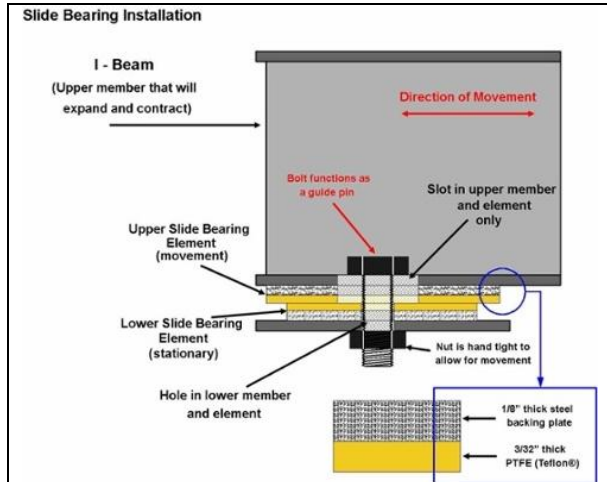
Schematic drawing of a typical slide bearing system. (Image courtesy of Steel Supply Company)
